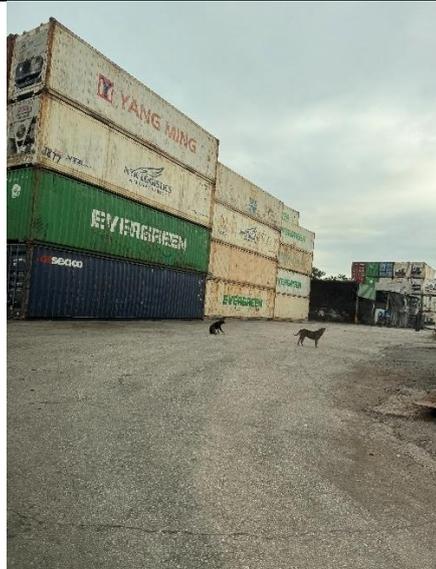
Storage containers are observed. The ground is paved with concrete in good condition. No crack and oil stains are observed.
